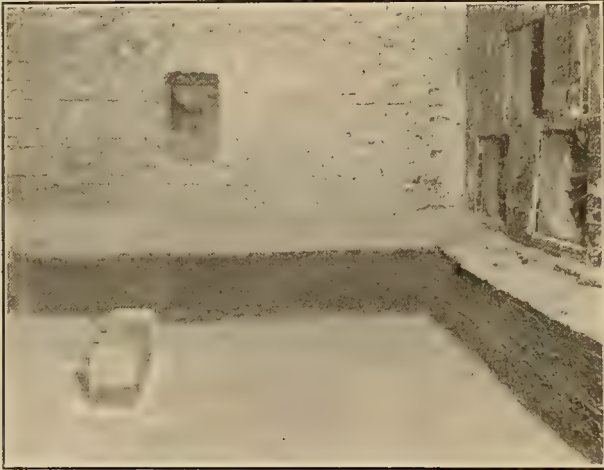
Location of bricks in boiler shown in Fig. 16.
